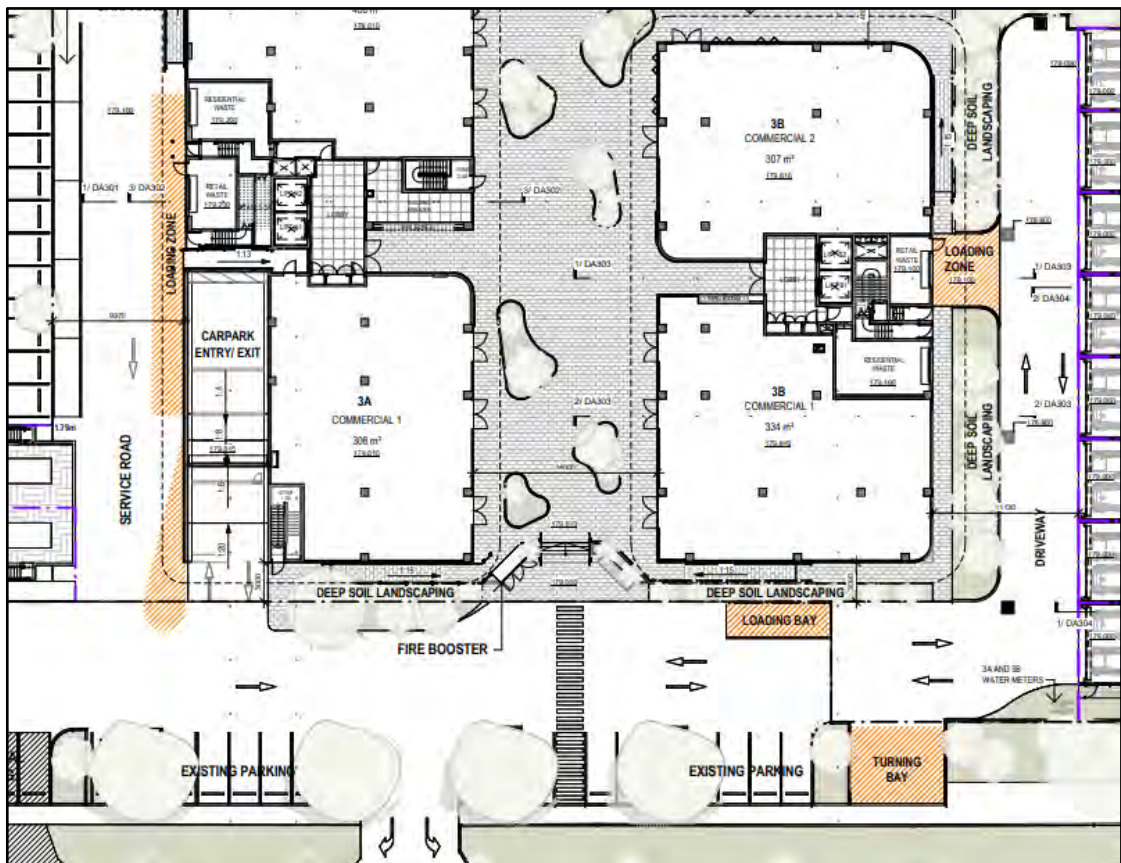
Loading Zones and Waste Storage/Collection Areas (Source: MDP 2024)
